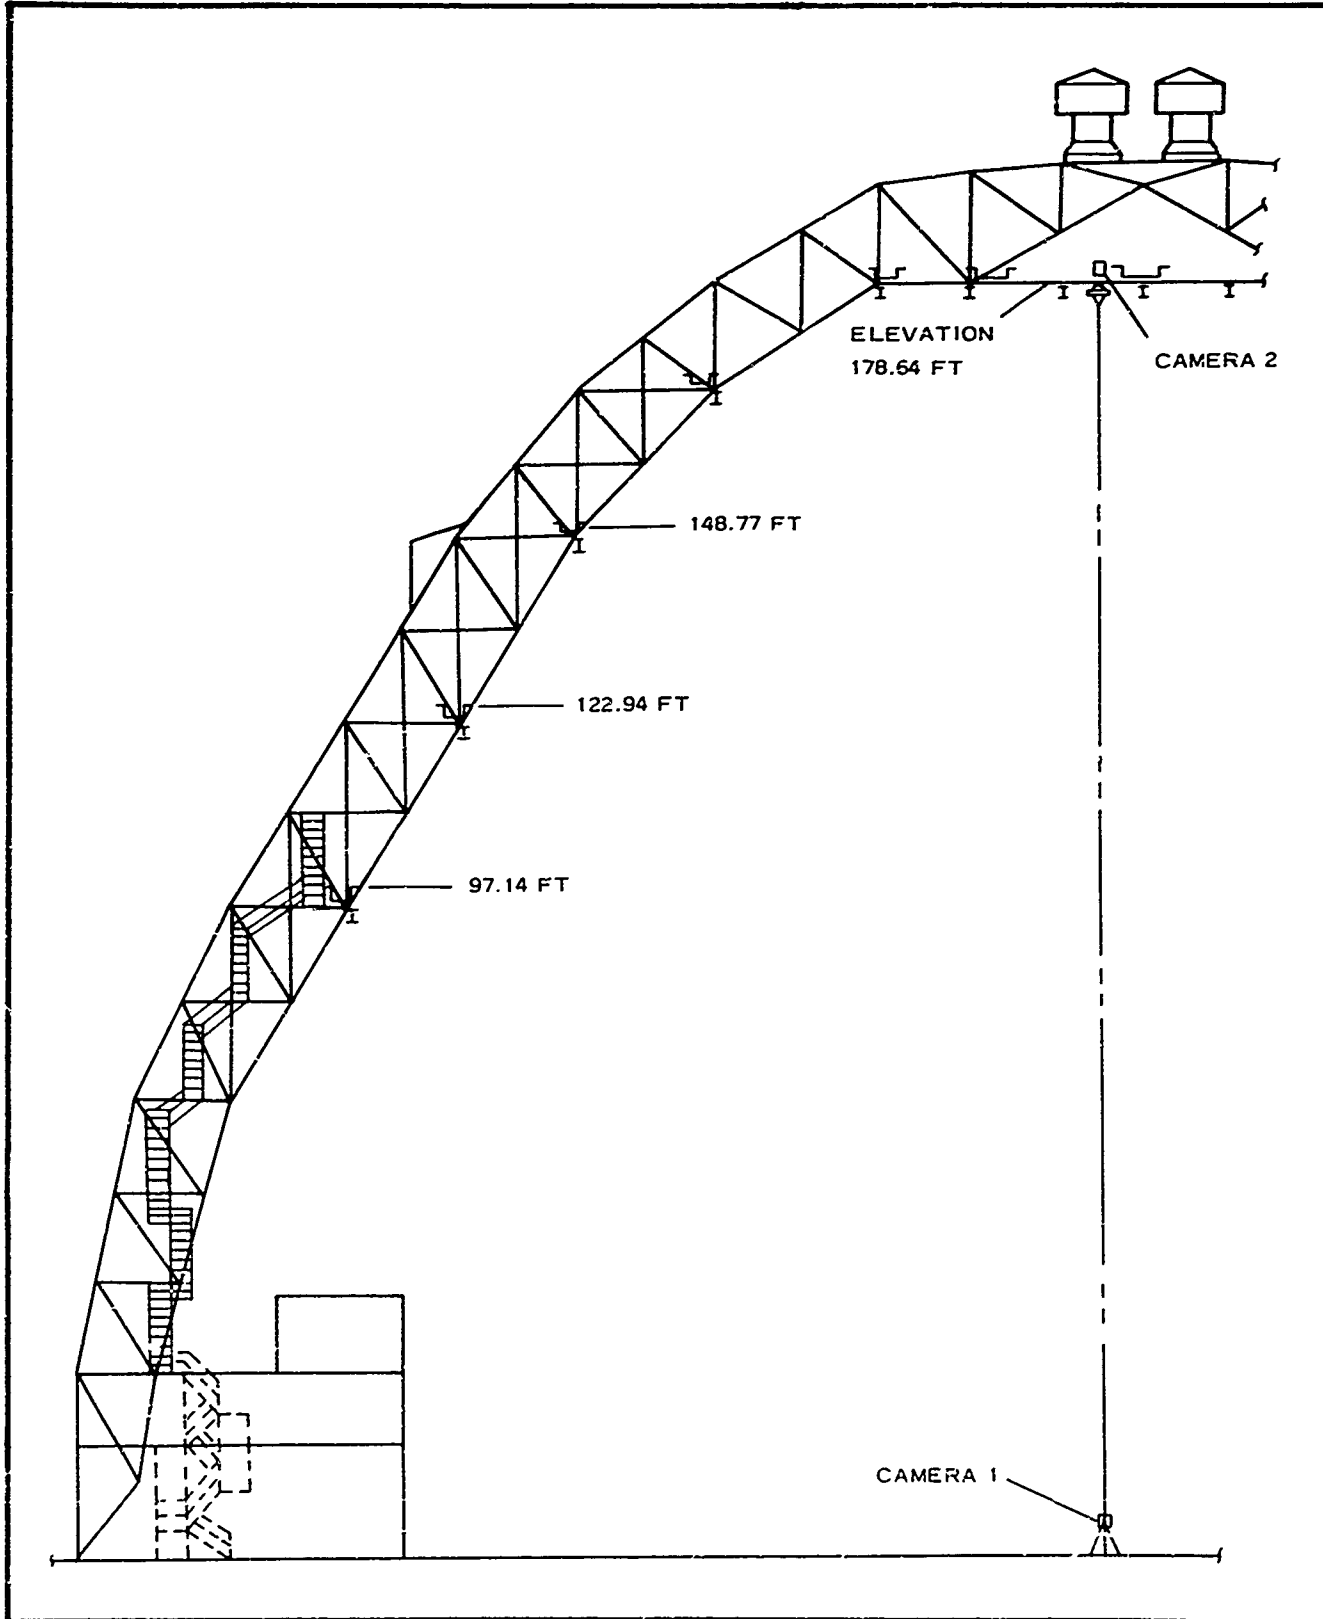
Airdock Cross Section Showing Monitoring Stations and Camera Installations
